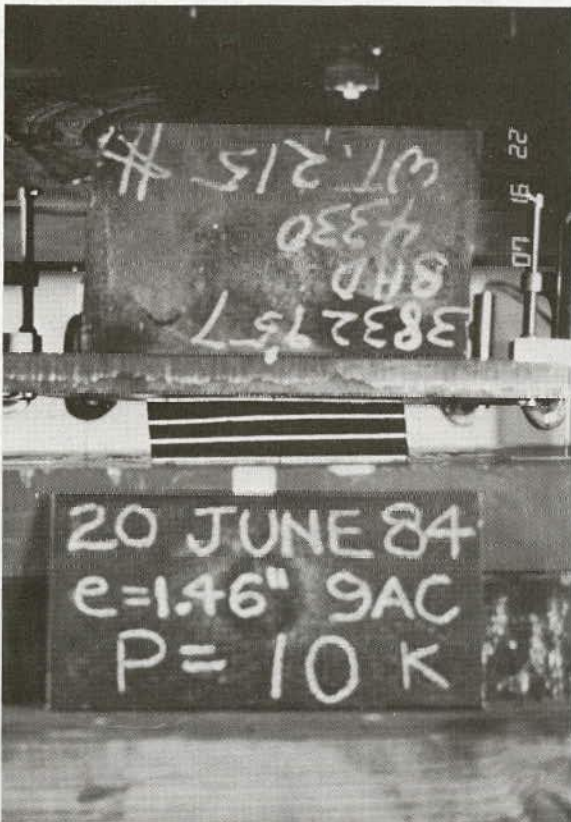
Test setup for the eccentrically loaded bearing rotation tests.
